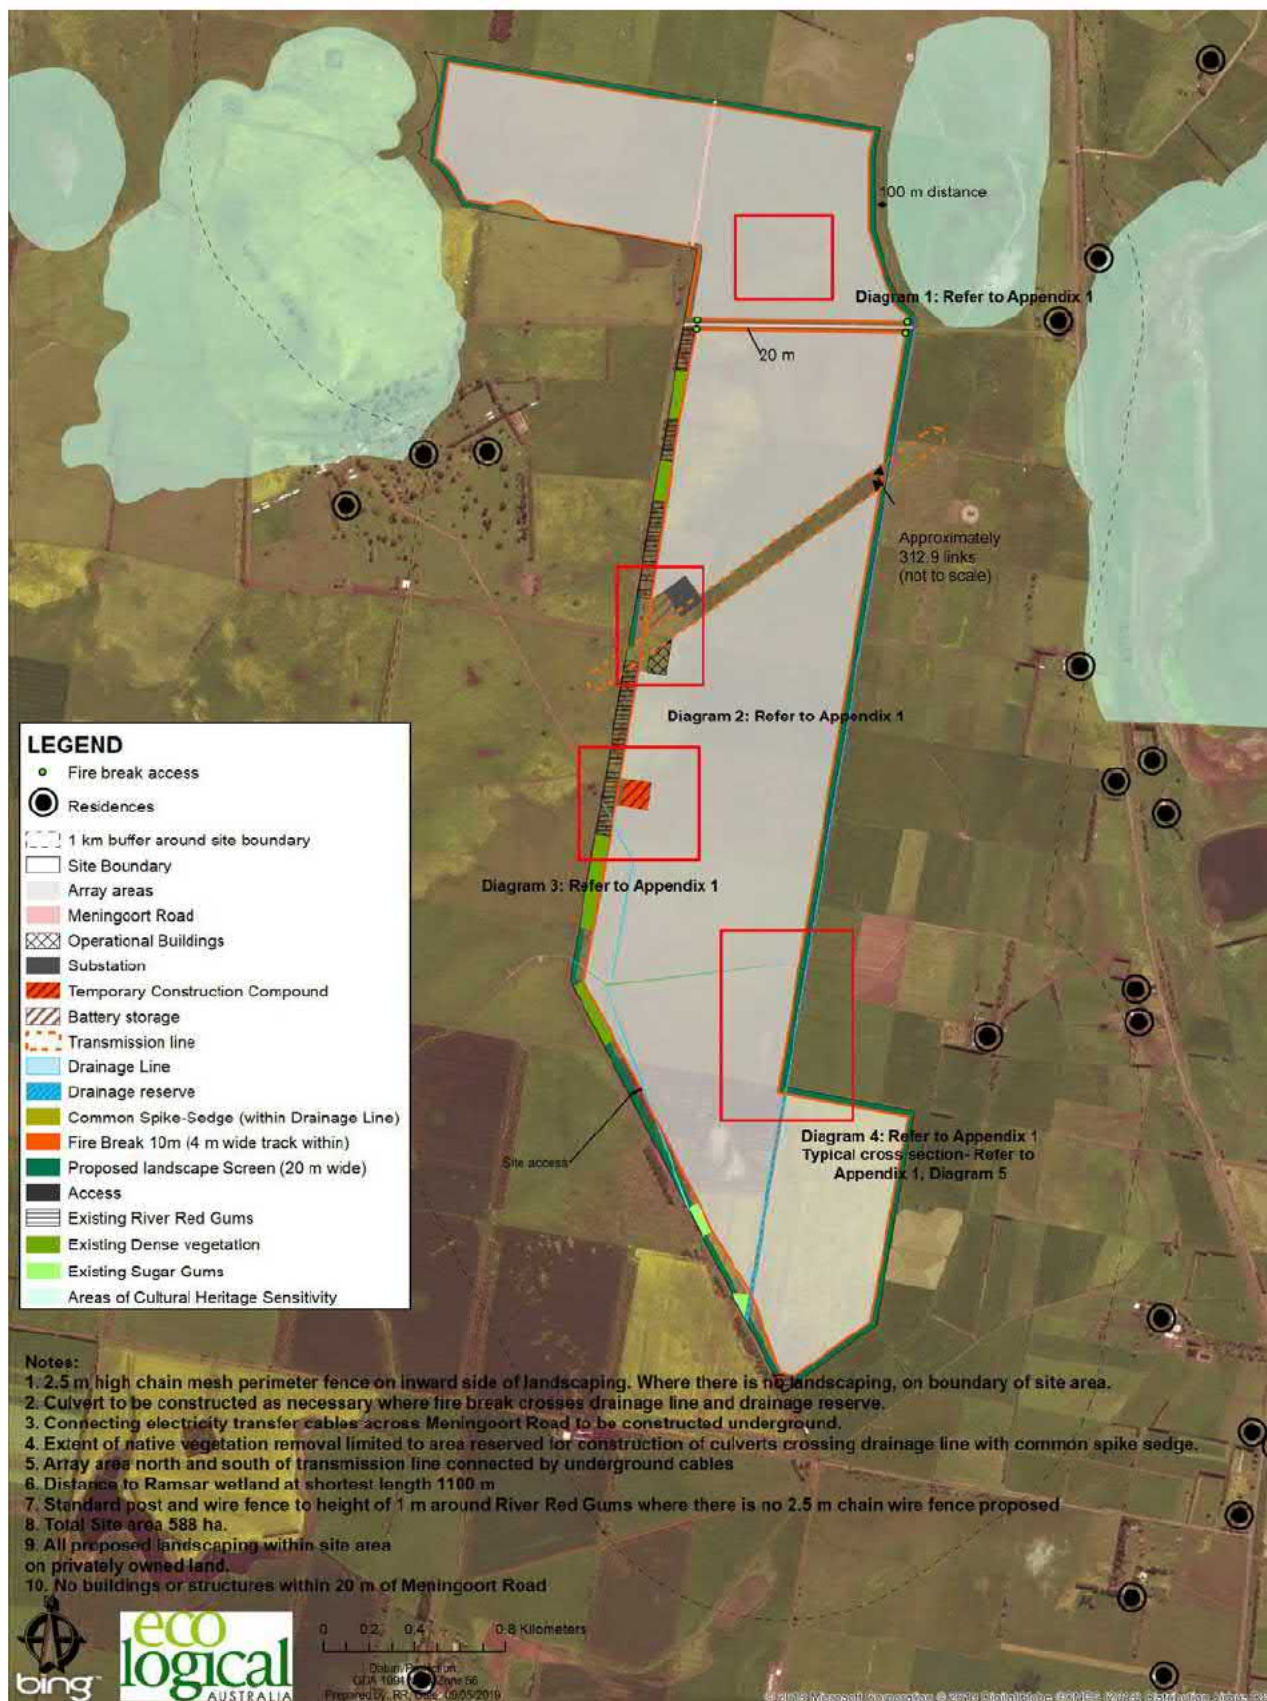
Amended Site Plan (Source: Amended Site Plan prepared by Ecological Australia 09 May 2019)
